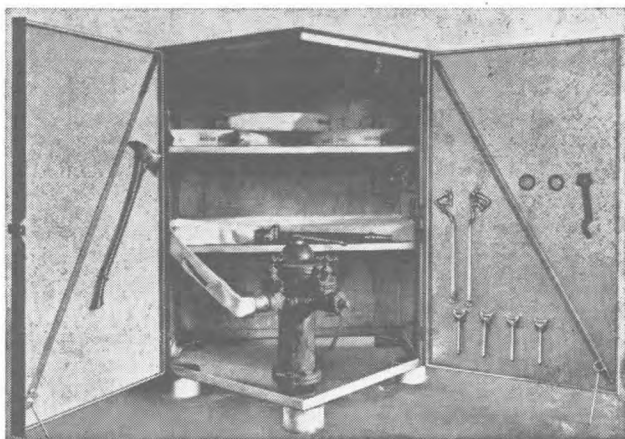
House of five-sided design for installation over a yard hydrant. Such houses may be of wood or steel with a tight floor installed after erection.
